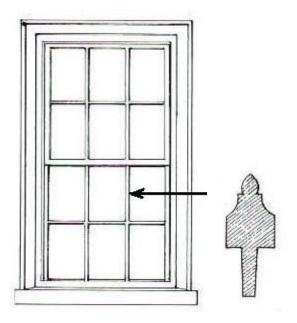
Typical Federal style sash window and cross section detail of a glazing bar with "ovolo" molding profile. Windows on the Jenkins House were replaced in the 1990s with units that generally followed the format of the existing single-hung 9/9 sashes that were reported to have replaced the originals. (Elements of Style, Calloway and Cromley, 1991)
